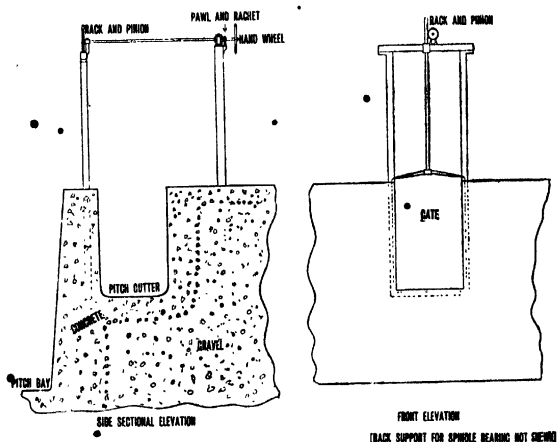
Pitch Gutter Outlet showing Gate Valve.
